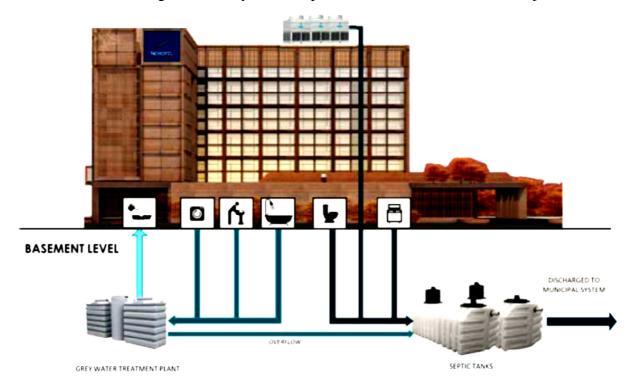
Sewage and Drainage System for Pullman Mandalay Hotel
